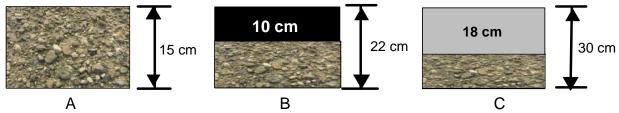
Dimensions of Roadway Options (A – Gravel, B –Asphalt, C- Non-reinforced concrete)
